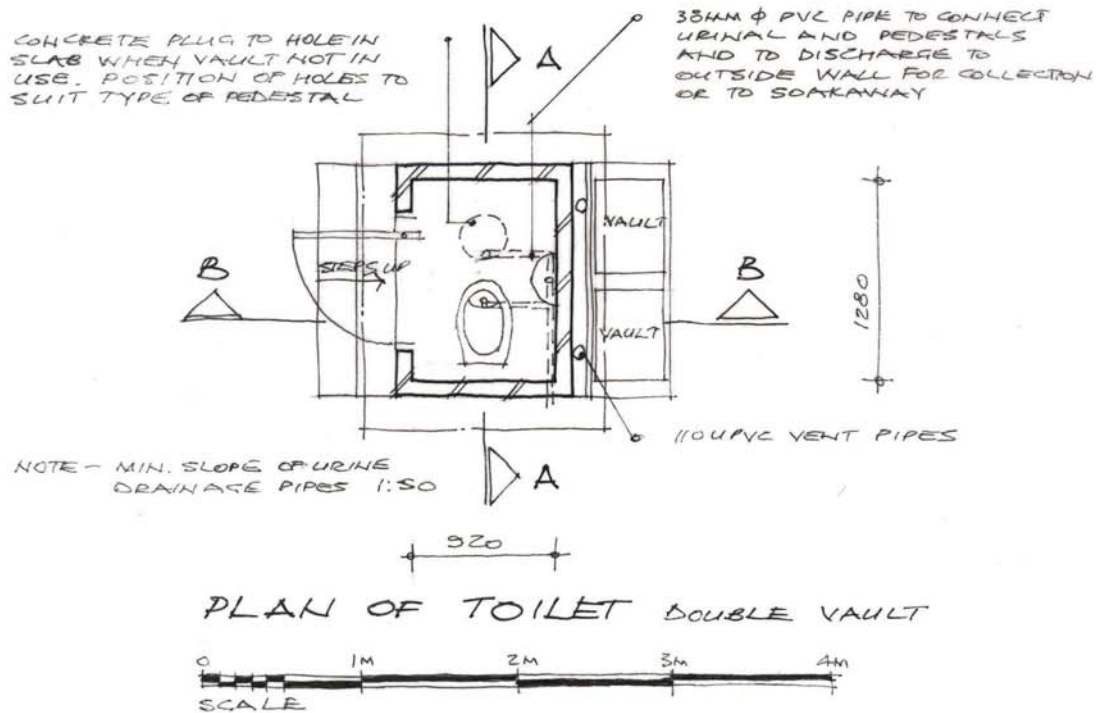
(c): Details of a double vault UD toilet. Note reduction of steps by constructing the floor of the vault below ground level.
